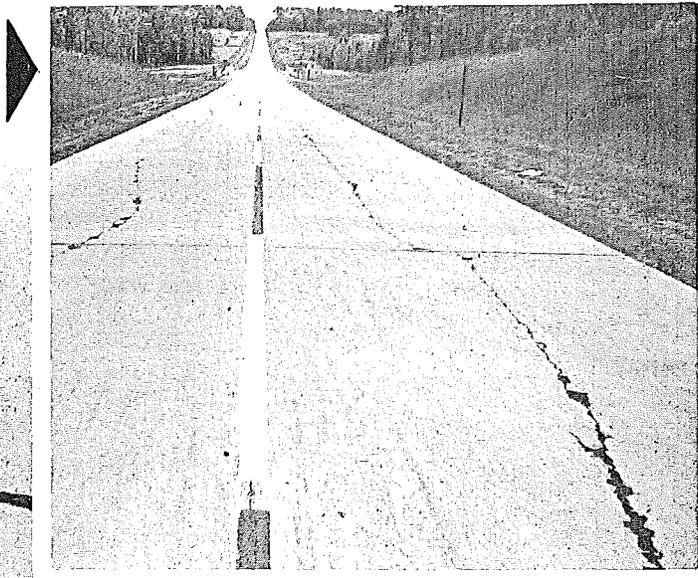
Infiltration crack. A short crack following a course approximately parallel to the centerline and starting from either a transverse joint or a transverse crack. Sometimes known also as a "restraint crack" or "crowfoot crack."
